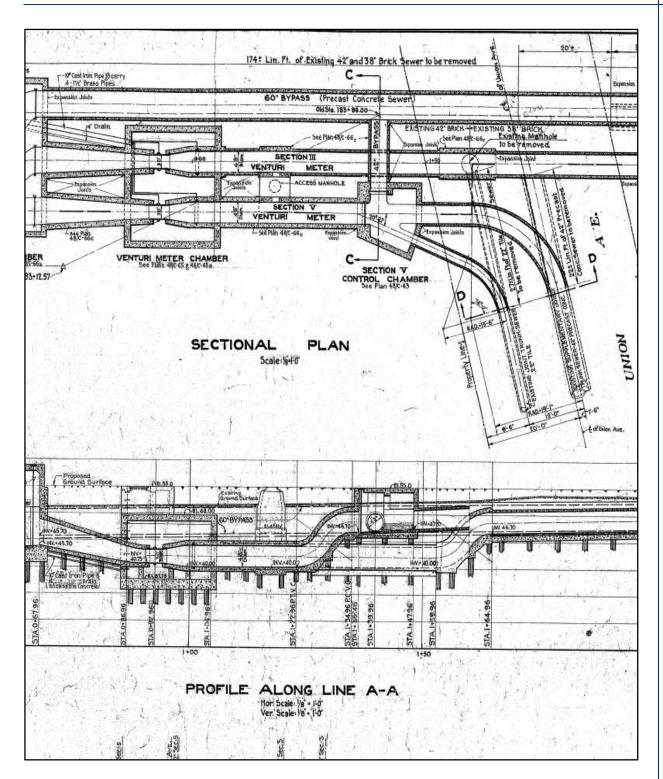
Construction Drawings of Union Avenue Venturi Meter
